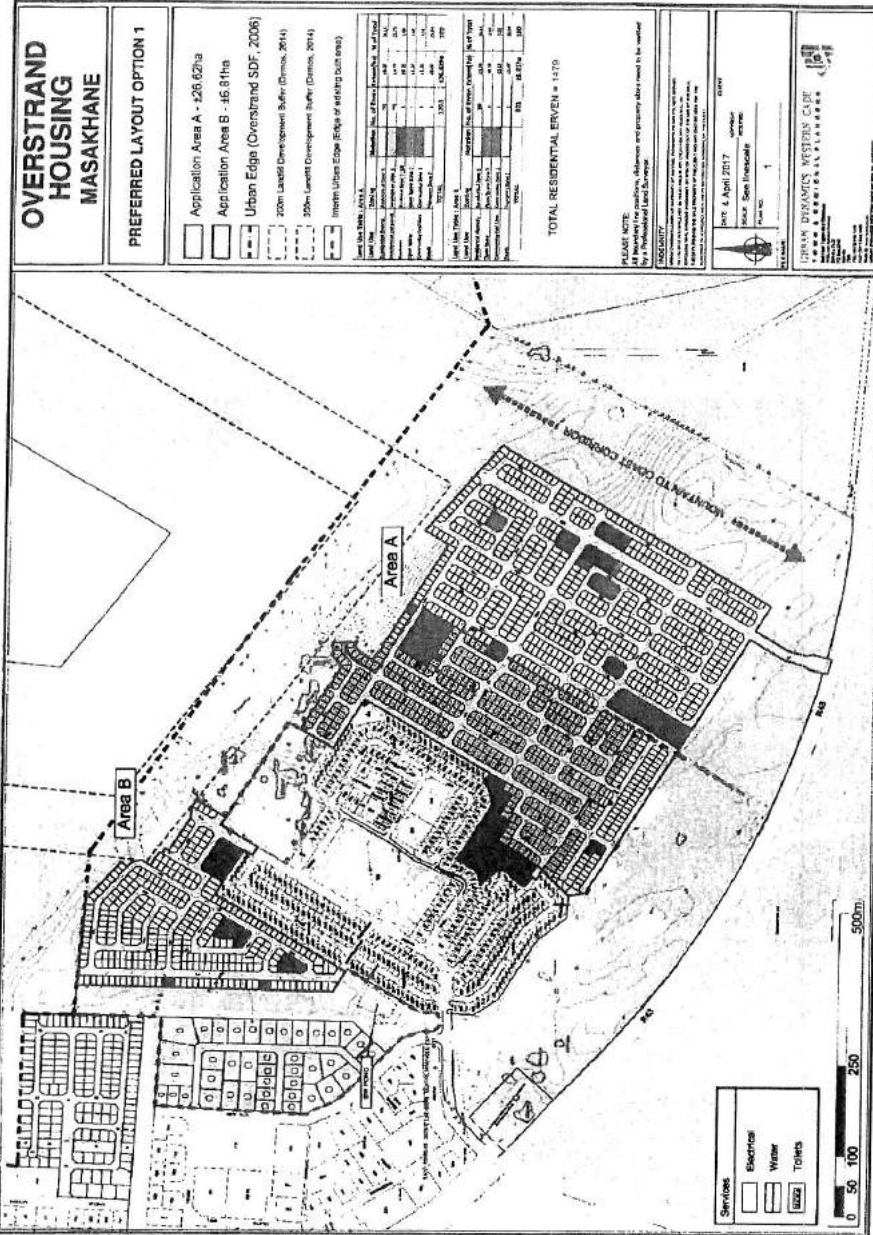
Site Plan for the Gansbaai low cost housing Development.
